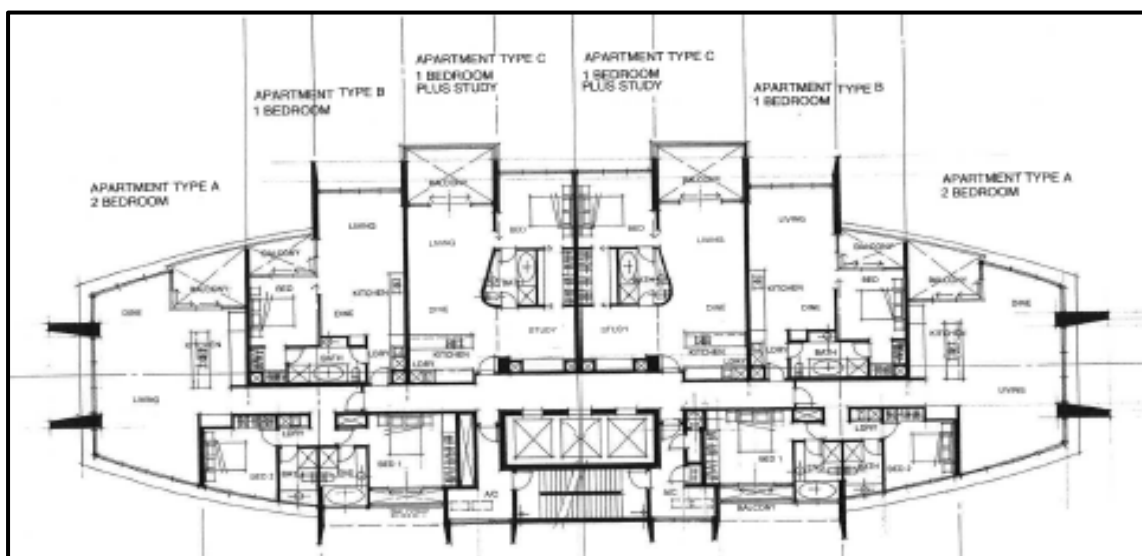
Typical levels 4-30 apartment floor plan layout
